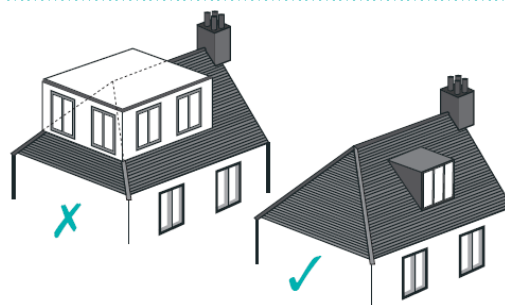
Size and scale of dormer windows. Dormers should be of an appropriate size and position
